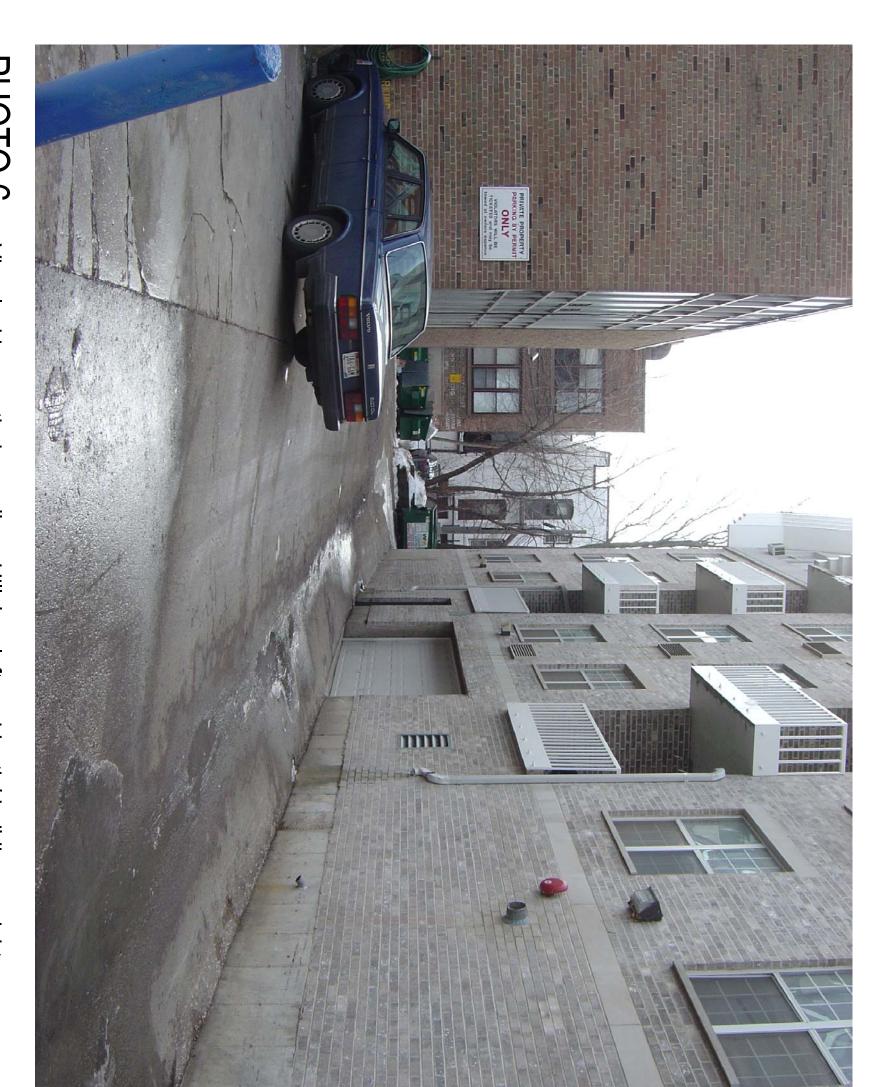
View looking south down alley - Hillel on left, residential building on right
